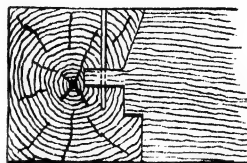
Tusk Tenon Joint with Thick Girder.
